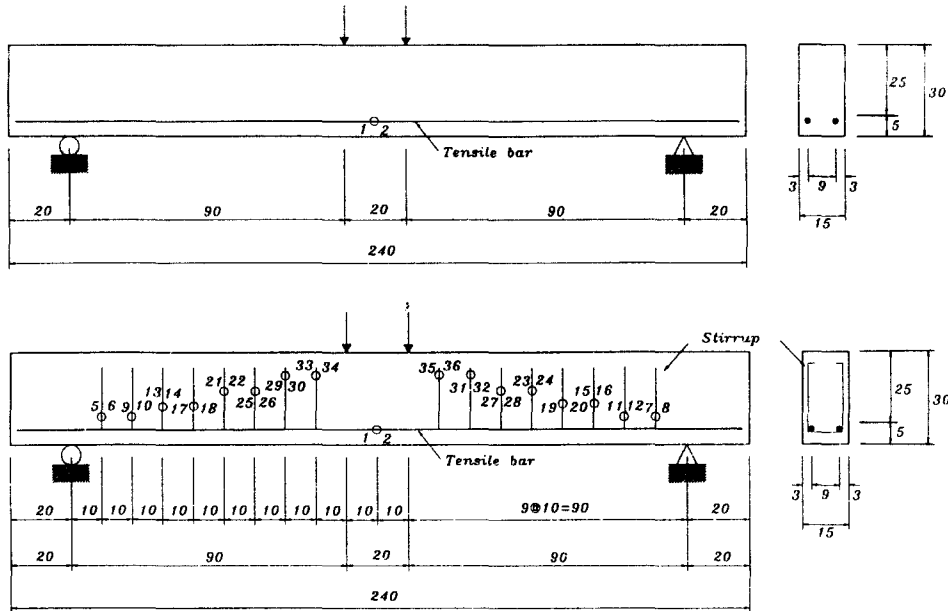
Shape of static test beams and loading arrangement (unit : cm)
